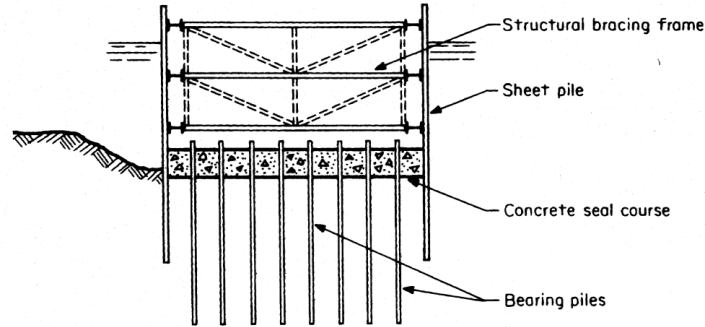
Cross-section of a typical steel cofferdam breakwater [35].
